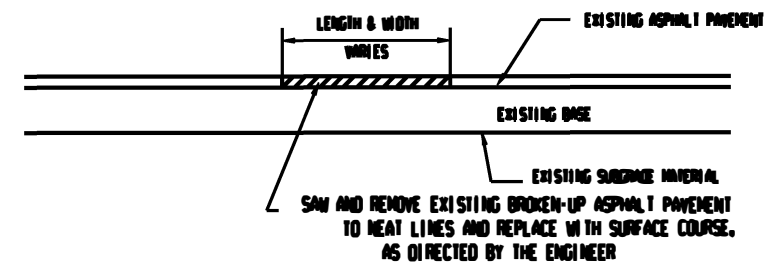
DETAILS OF REPAIRING EXISTING PAVEMENT PRIOR TO RESURFACING FOR FULL DEPTH AND MILLING
